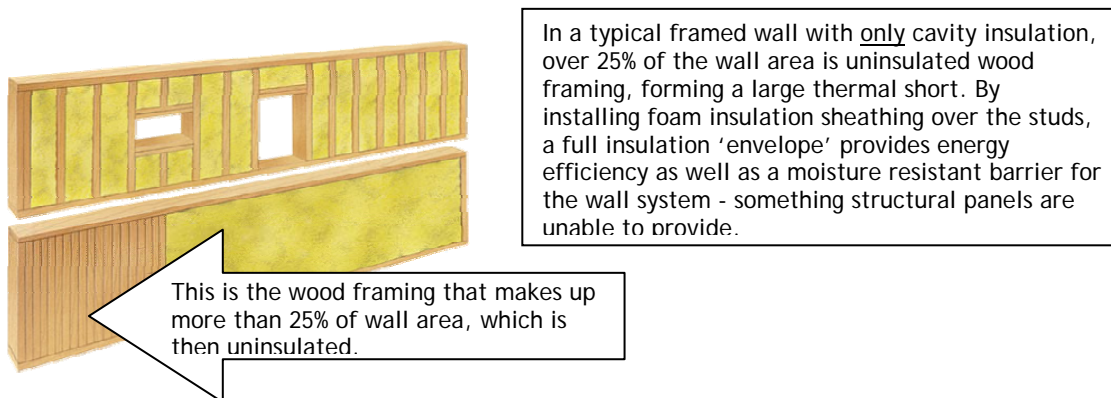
Illustration of thermal leaks in a wood frame wall without foam sheathing.
